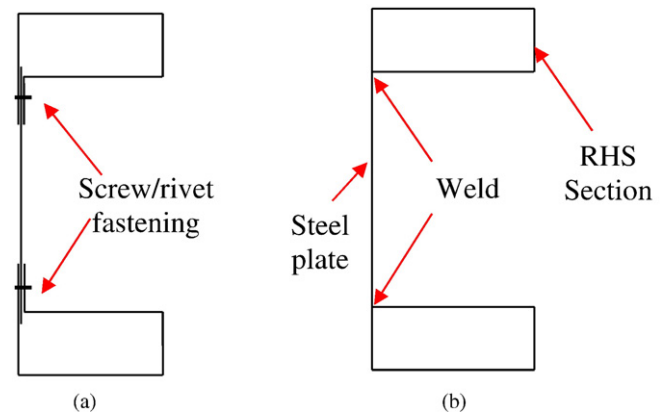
Hollow flange channel sections, (a) screw/ribose fastened HFC section, (b) welded HFC section.
